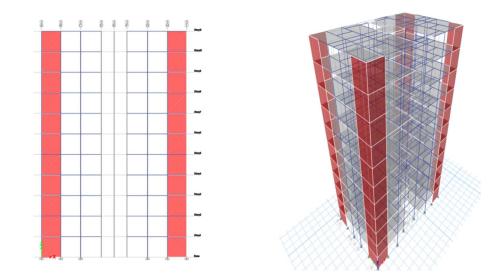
Two-dimensional and three-dimensional views of a multi-story construction with a solid shear wall
